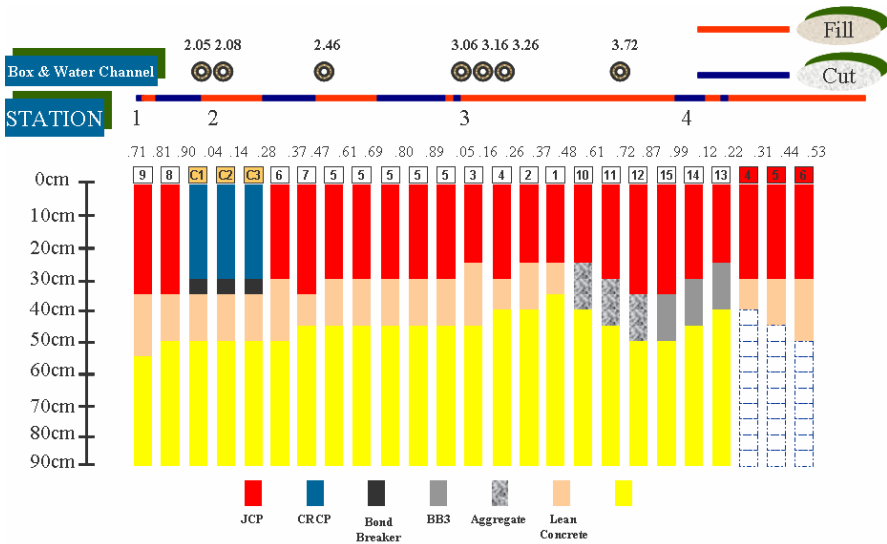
Layout of concrete pavement cross-sections applied in the test-road
